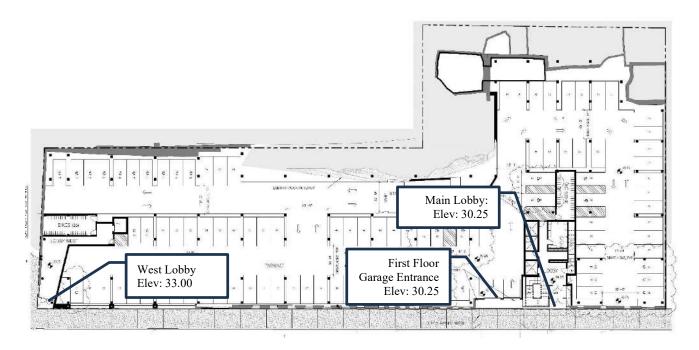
First floor building access points (per CBP Architect 6/06/24 plans)
